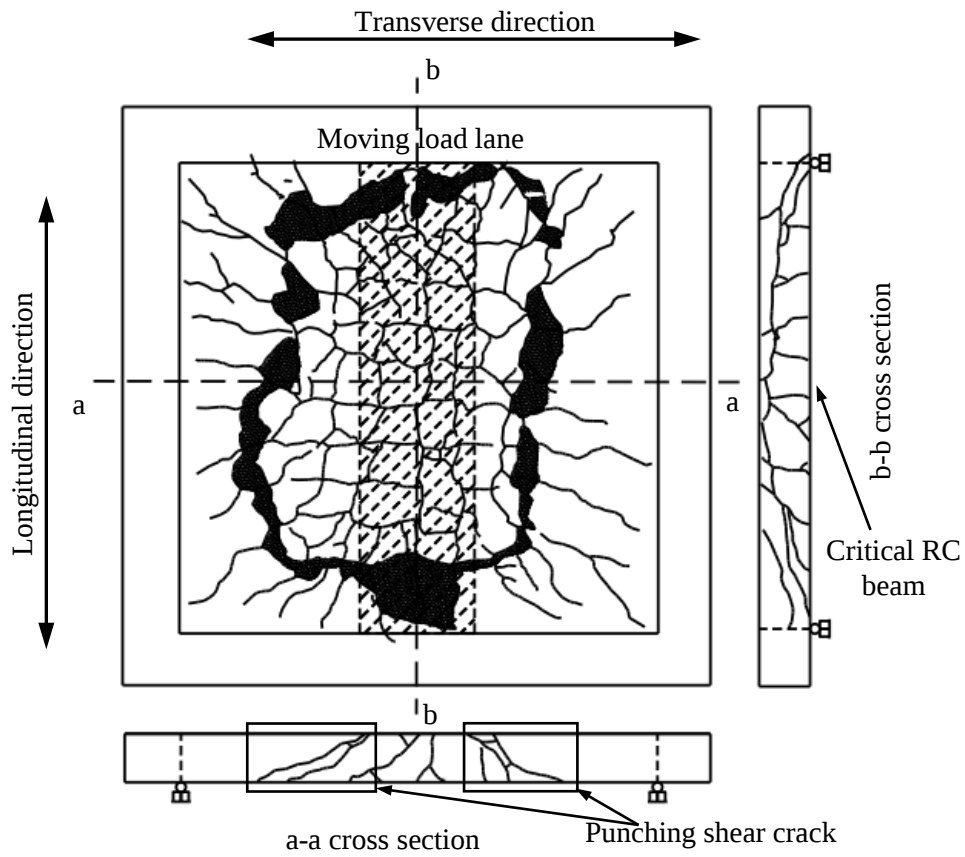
A typical failure crack pattern of an RC slab under cyclic moving loads
